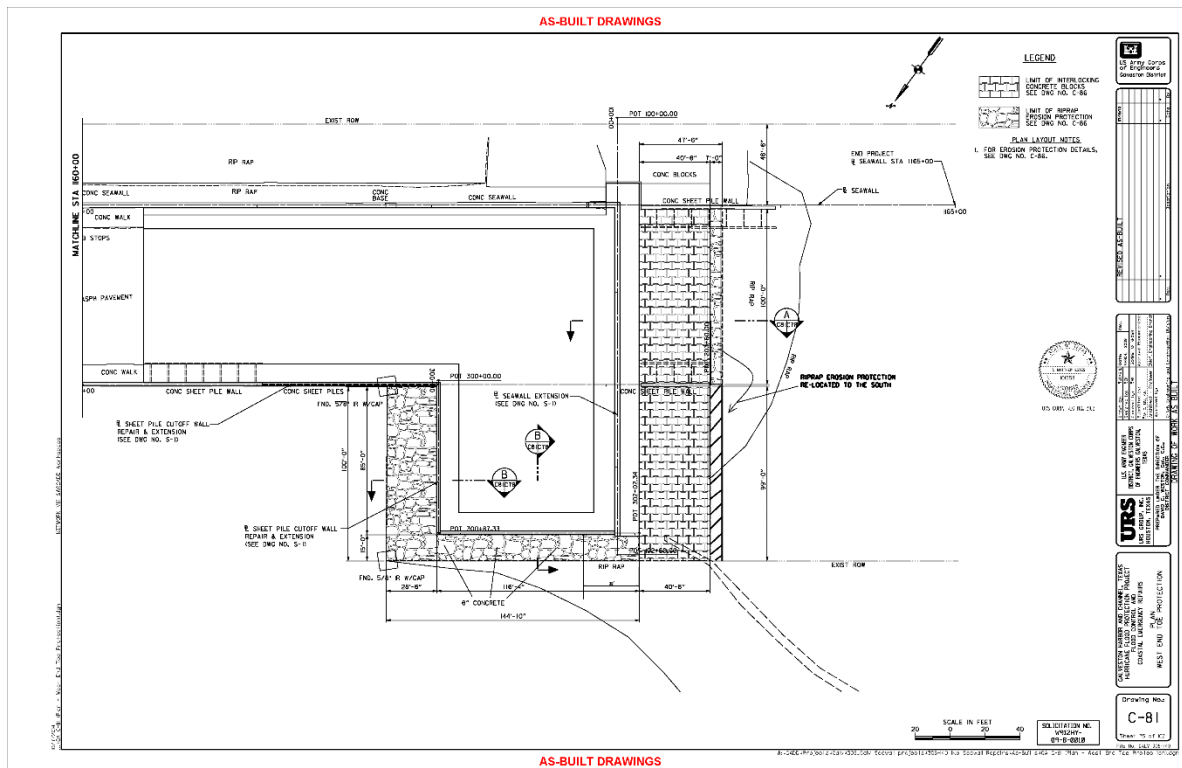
West end seawall construction, plan view of toe protection (USACE-SWG, 2009)
